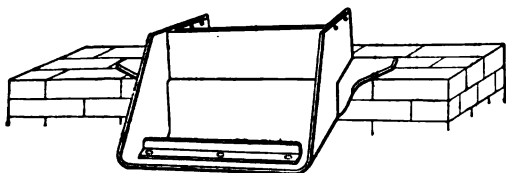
Duplex Extra-heavy Wall-hanger for Mill-construction
